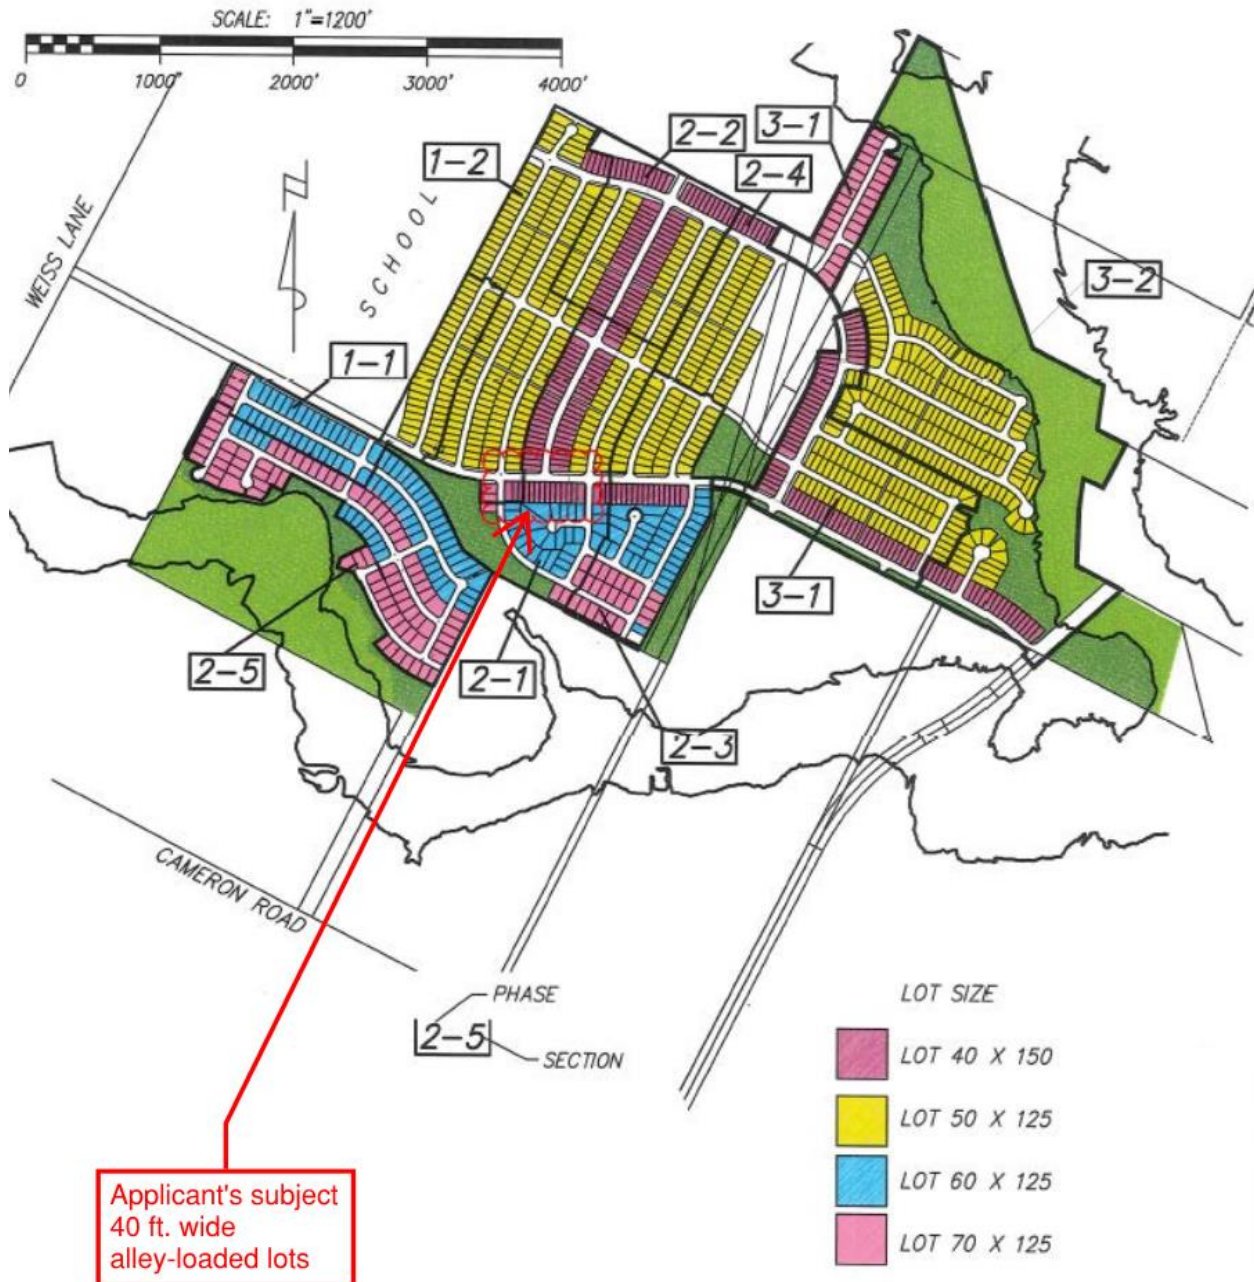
Location of Applicant's Alley-Loaded, Attached Garage Products
